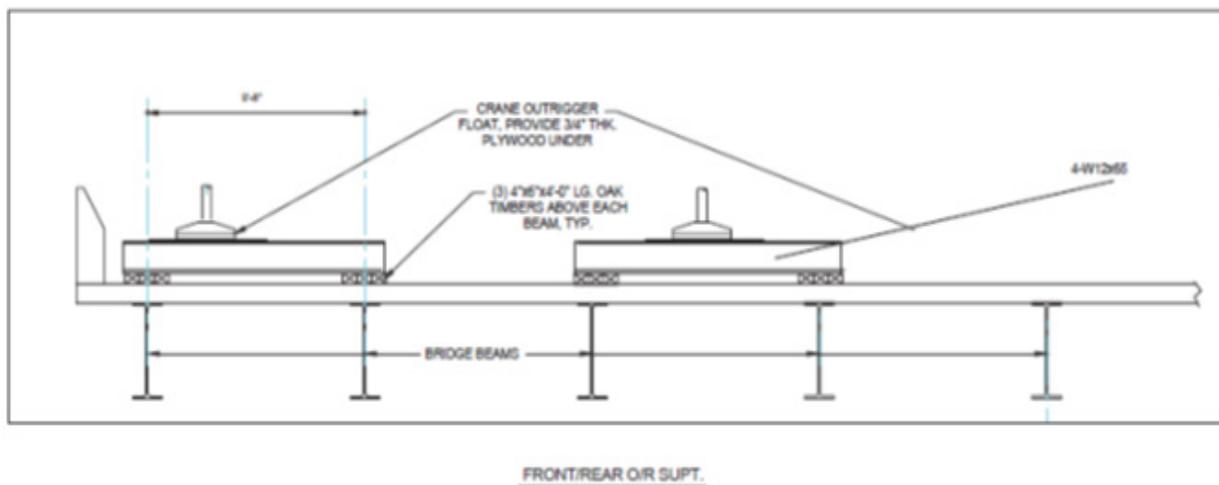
Potential Erection Crane Staging On Existing Bridge Deck
